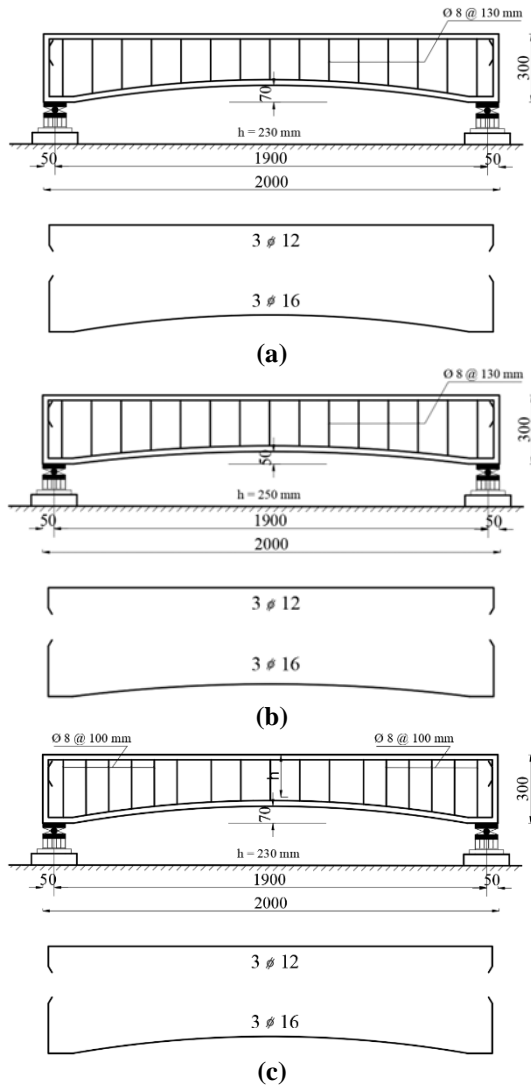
Geometry and reinforcement details of group G3 beams (Dim. in mm)
